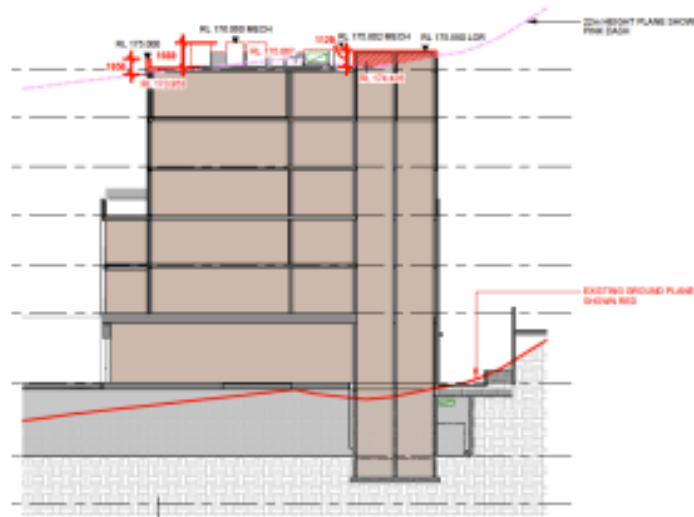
Cross section 3 – Building D (Cox drawing DA-99-08)
